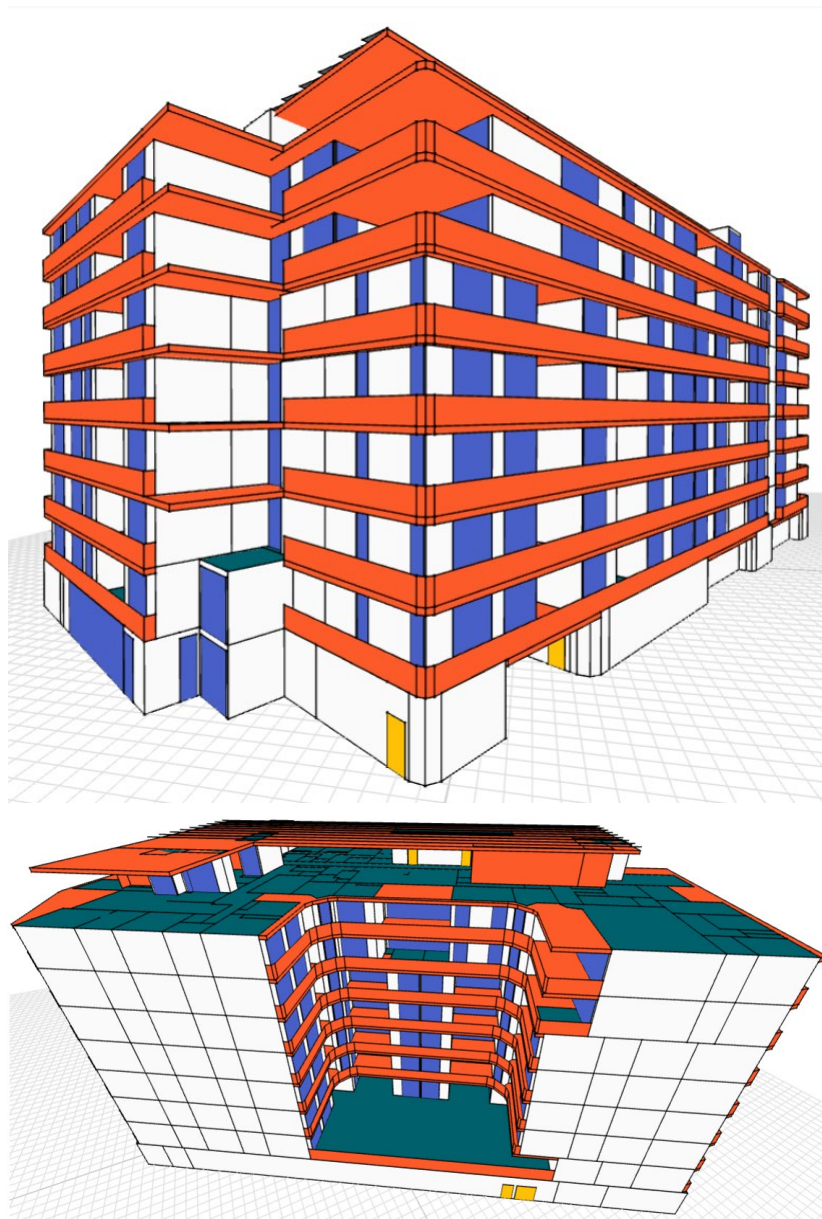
Daylighting Model in BetterBuilding (Speckle)
